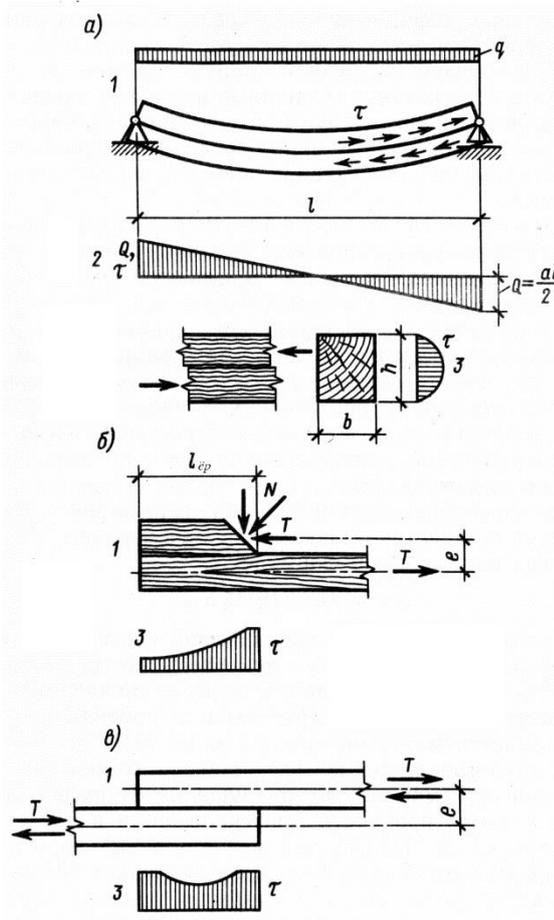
Cracking elements: a-bending crack; b-the same, from one-sided breaking forces; v-same, from the two-way breaking forces.
